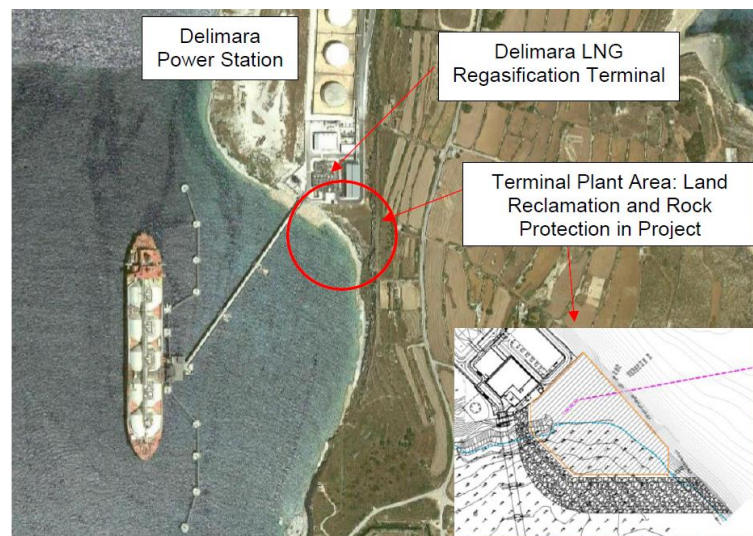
Location of Delimara Terminal Plant and surrounding facilities
